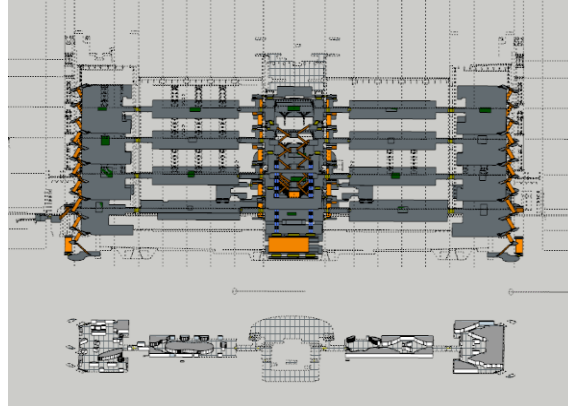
Cultural center museum floor plan rendered in SketchUp.
